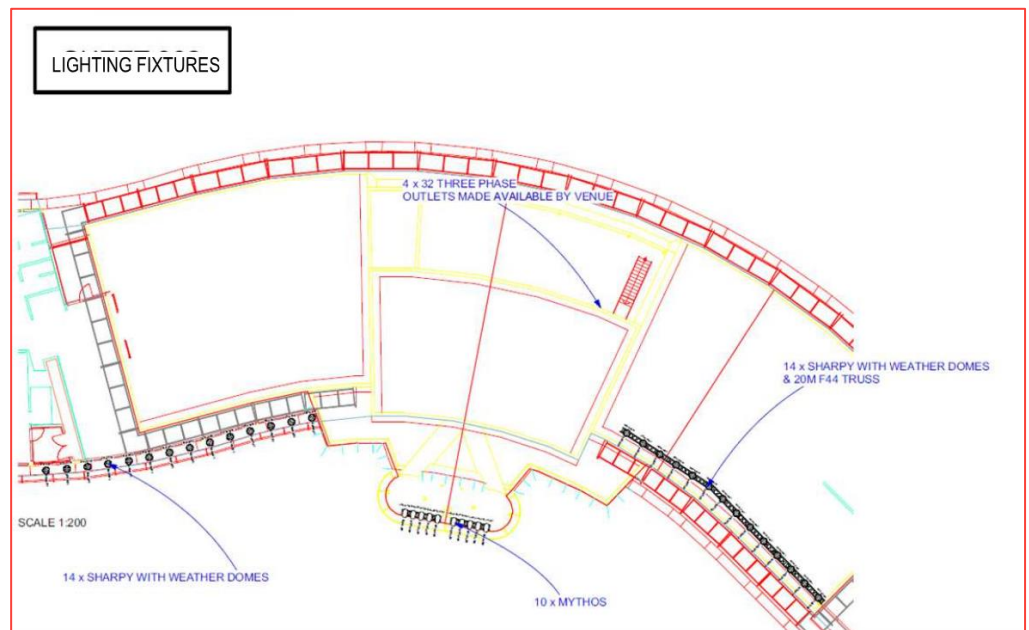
SLE Astral Hotel Rooftop Lighting Layout
